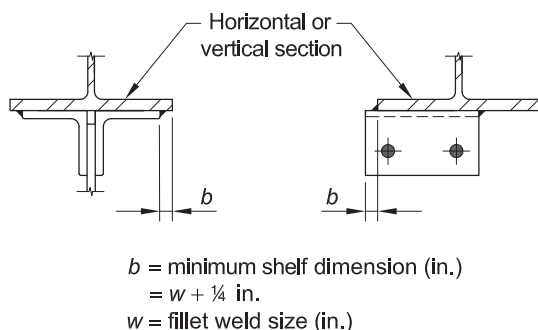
Recommended minimum shelf dimensions for fillet welds.
